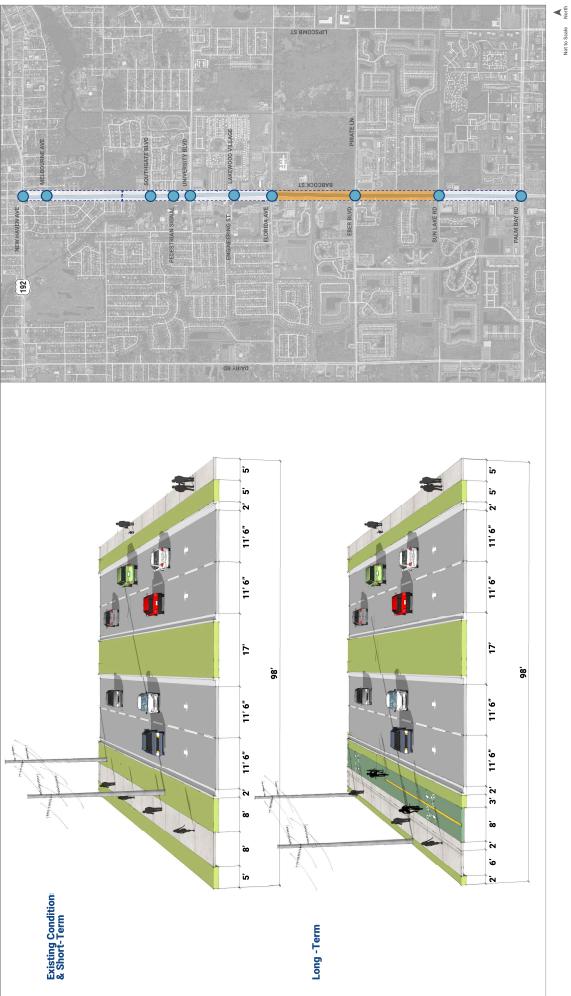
| Sun Lake Road to Florida Avenue Typical Section
